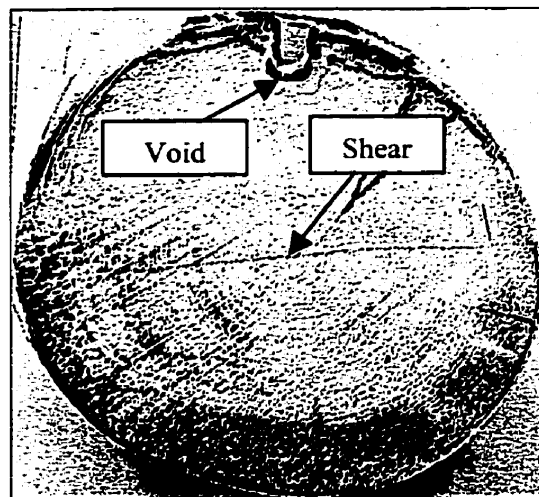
Cross-section of specimen P3-2-406-1 after failure.
